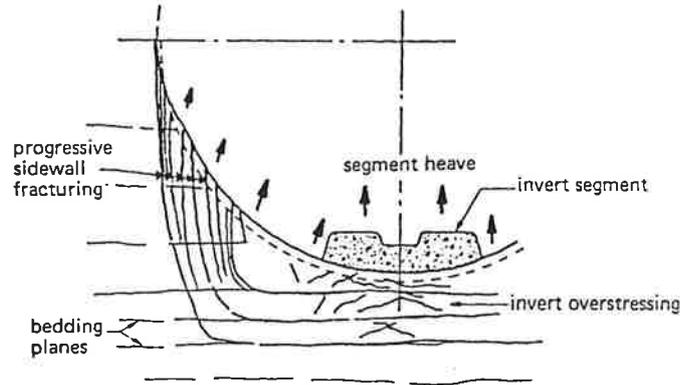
Example of overstressing mechanism in the lower sidewall and in invert of a tunnel in Cyprus (from Sharp et al., 1993)
